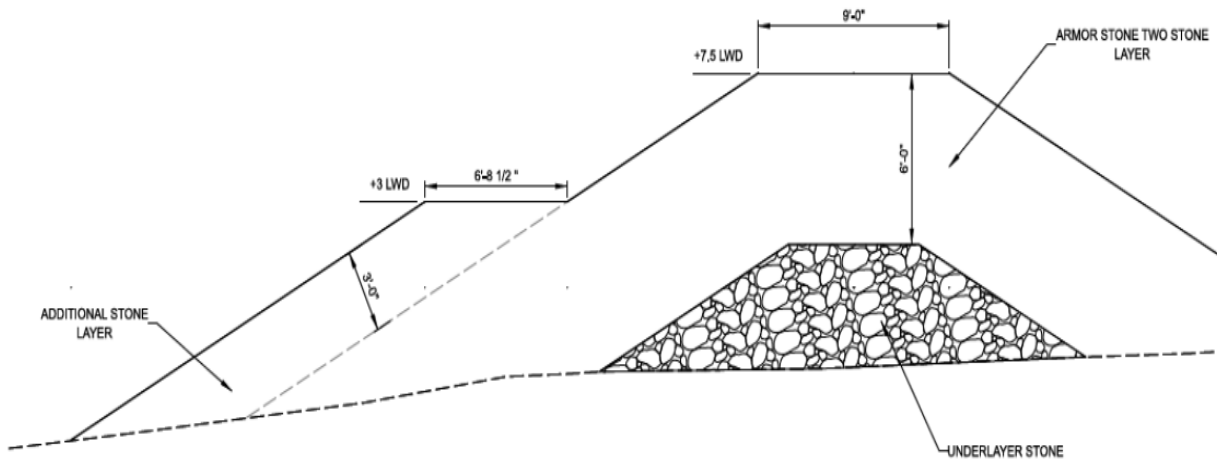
Rubblemound pier extension of Reach C (new Reach E) of the west pier repair.
